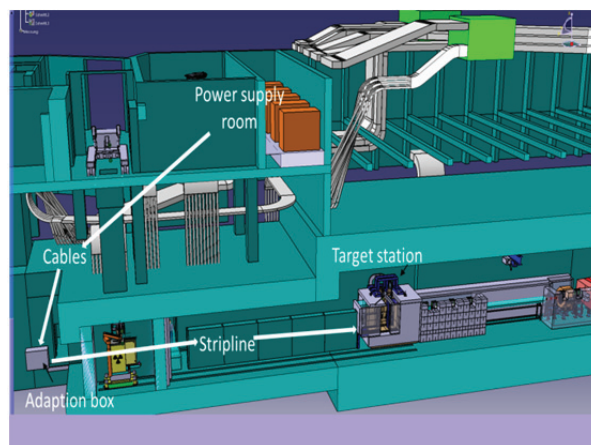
In FAIR Accelerator Complex, planned pbar separator and horn system will be housed in building K0321A/6C.
